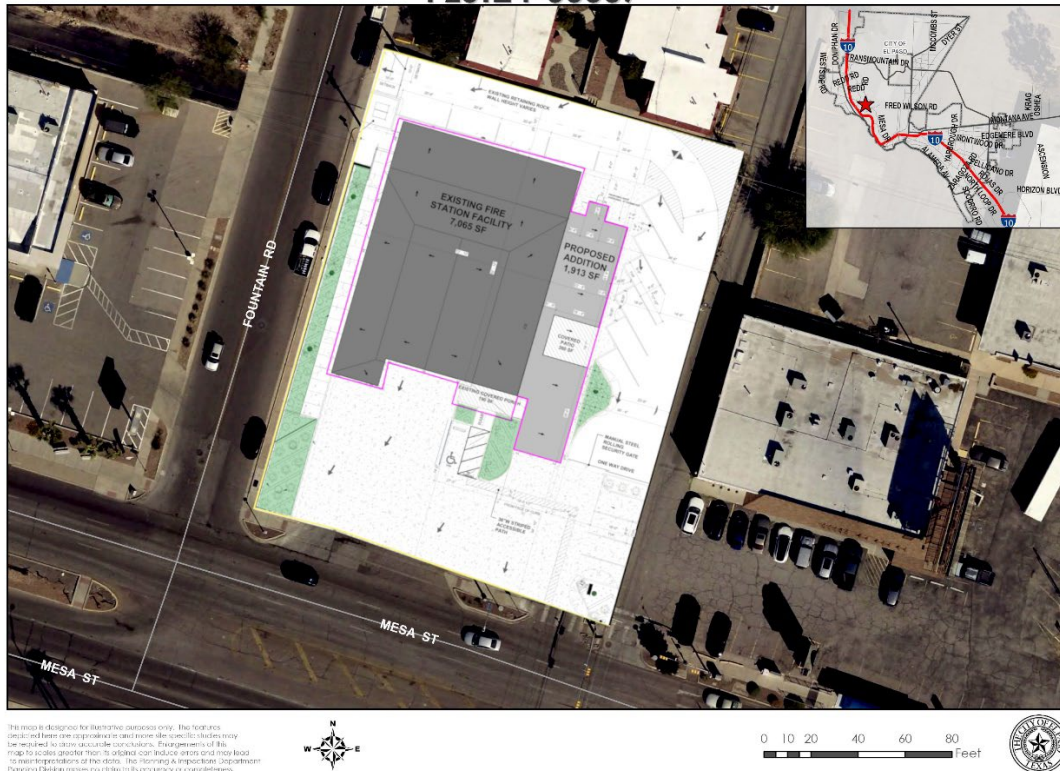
Figure A. Detailed Site Development Plan Superimposed on Aerial Imagery.
